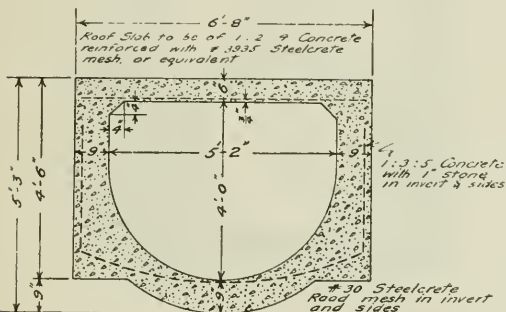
Cross-section of Storm Sewer Outlet
